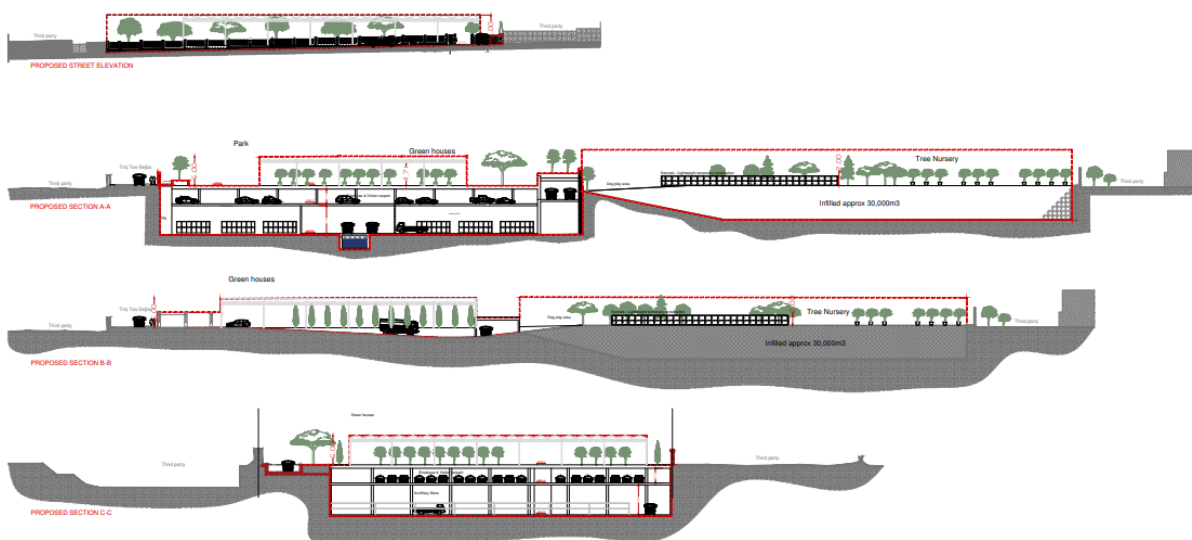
Proposed sections and elevation (Source: EApps doc PA/08500/21 – 85h)
